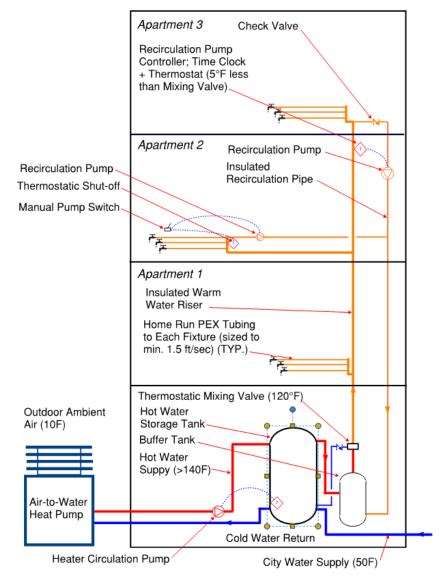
(WH6) Central Domestic Water Heating Distribution System Layout with Single -Pass Heat Pump
